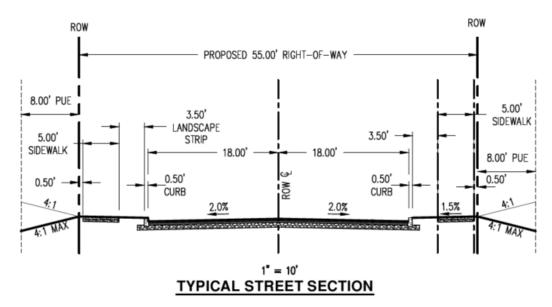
Planned Local Street Cross-Section. Source: AKS Engineering & Forestry, dated 6/9/21.
